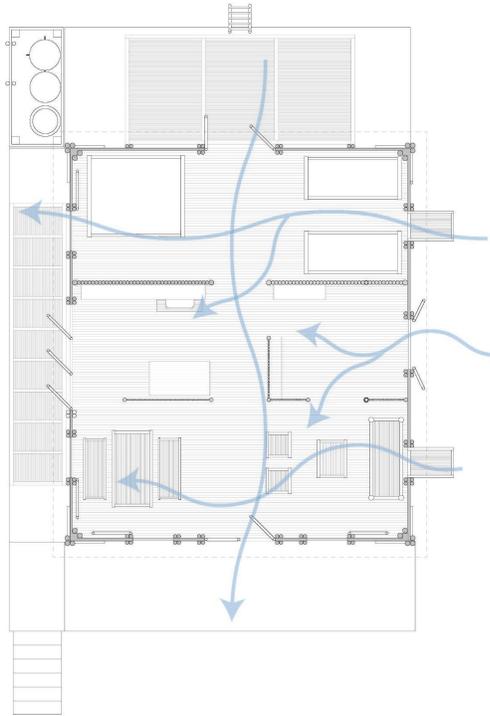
, Proposed Floor Plan: Wind (Source: Author)
